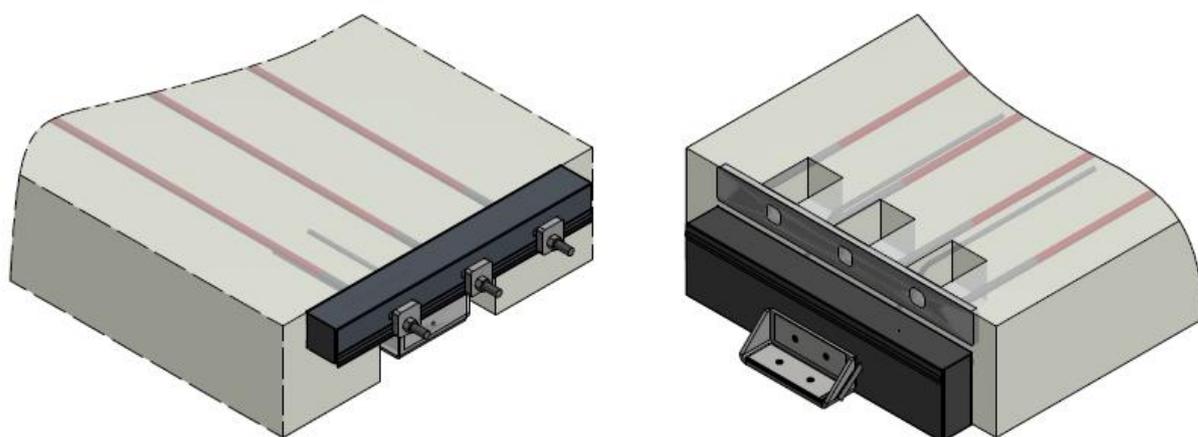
Halfen Iso-Element HIT-HP PI, slab-side installation
